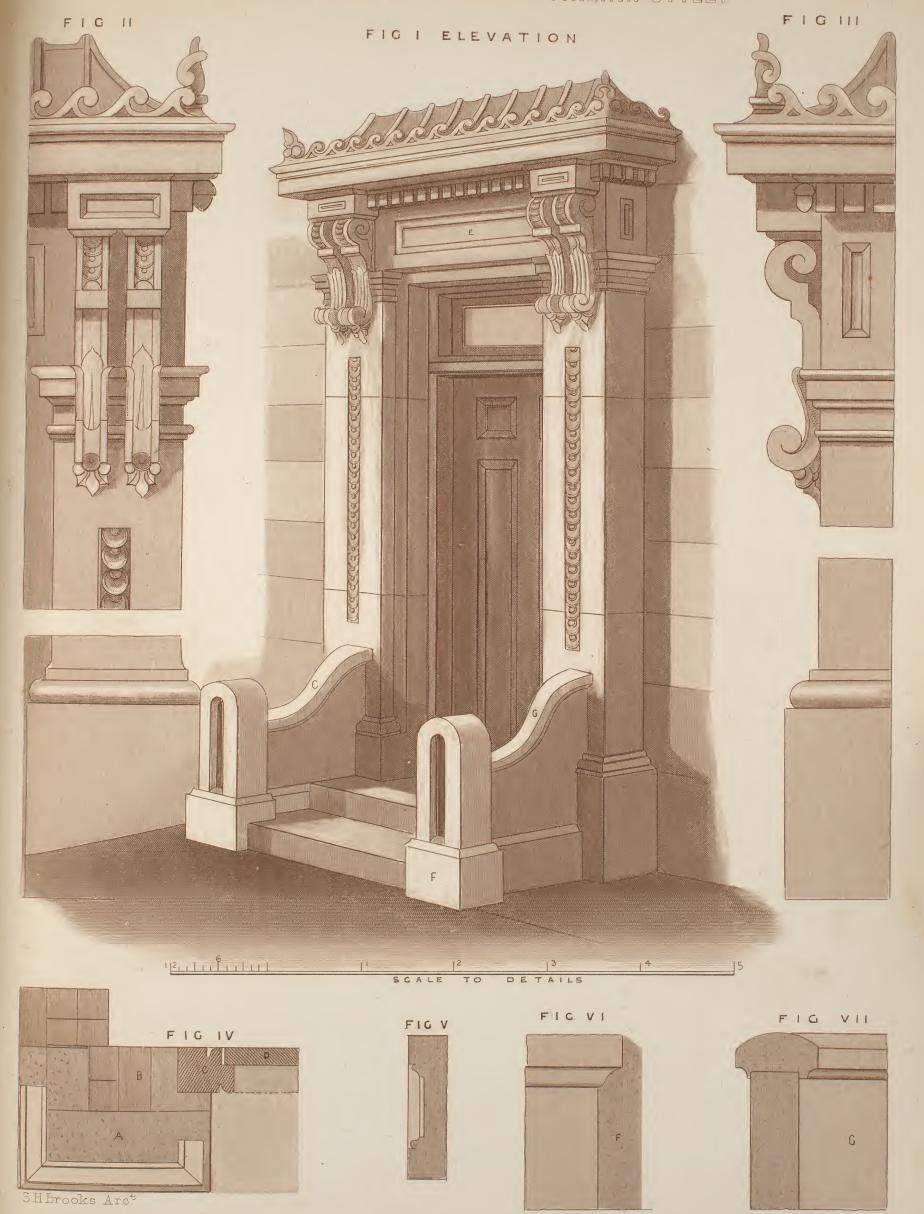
## DETAILS OF ENTRANCE DOOR. PLATE 12.
